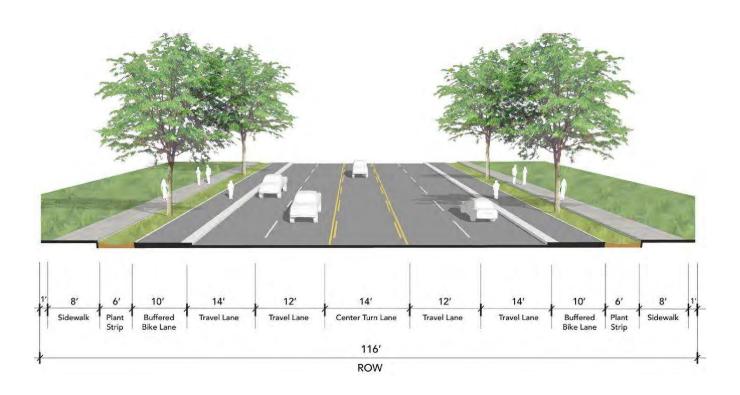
EAST ALBANY CONNECTIONS - TIMBER RIDGE EXTENSION
